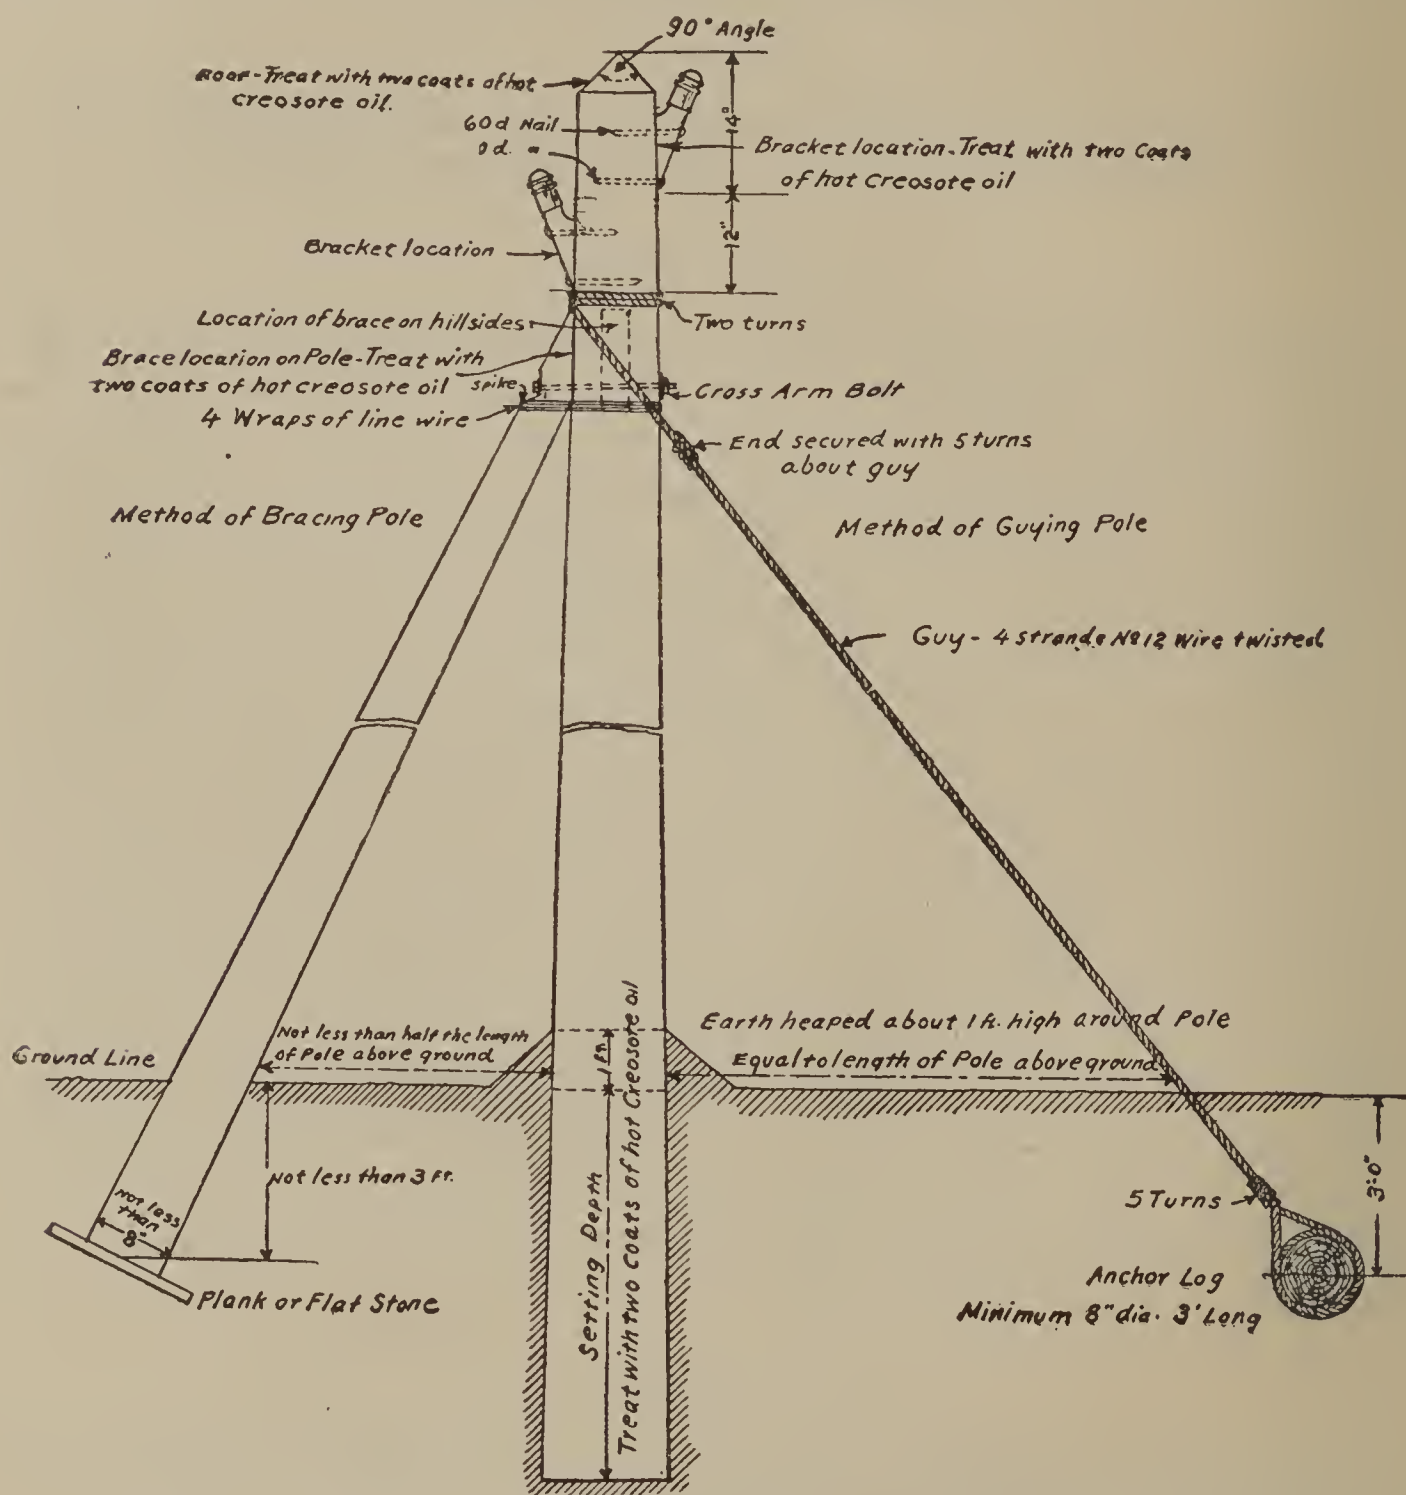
Diagram showing method of setting, guying, and bracing pole and locating brackets.
